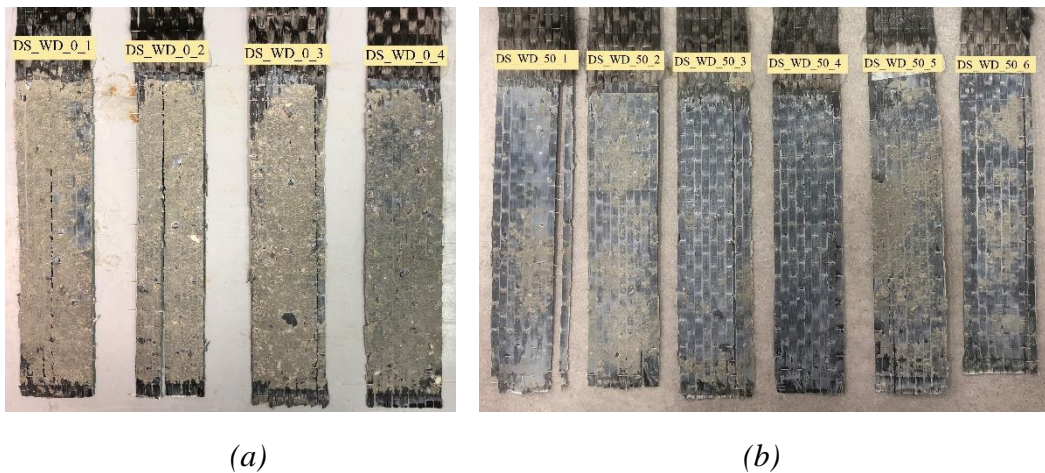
CFRP-concrete joints' failure modes under wet-dry cycles, (a) reference specimens, (b) conditioned specimens
